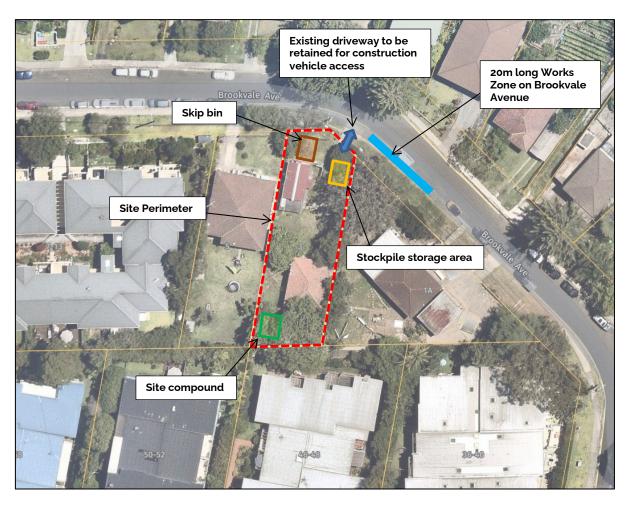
Site compound, construction vehicle access and works zone plan (Source: Nearmap)
